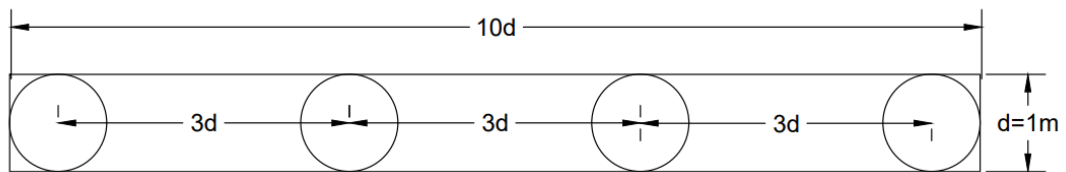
4 pile arrangement with 10 sqm. Raft size
